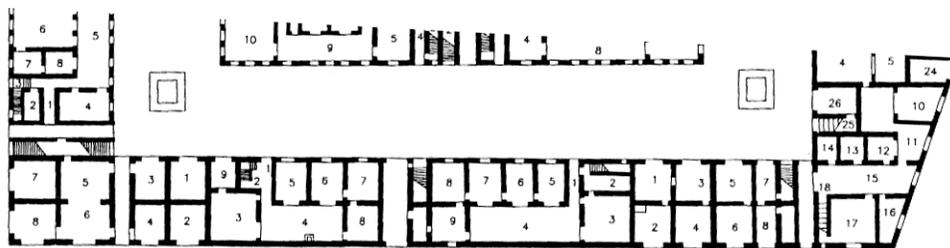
Plan of the southern shops in the outer ring of the Garden Houses complex.
